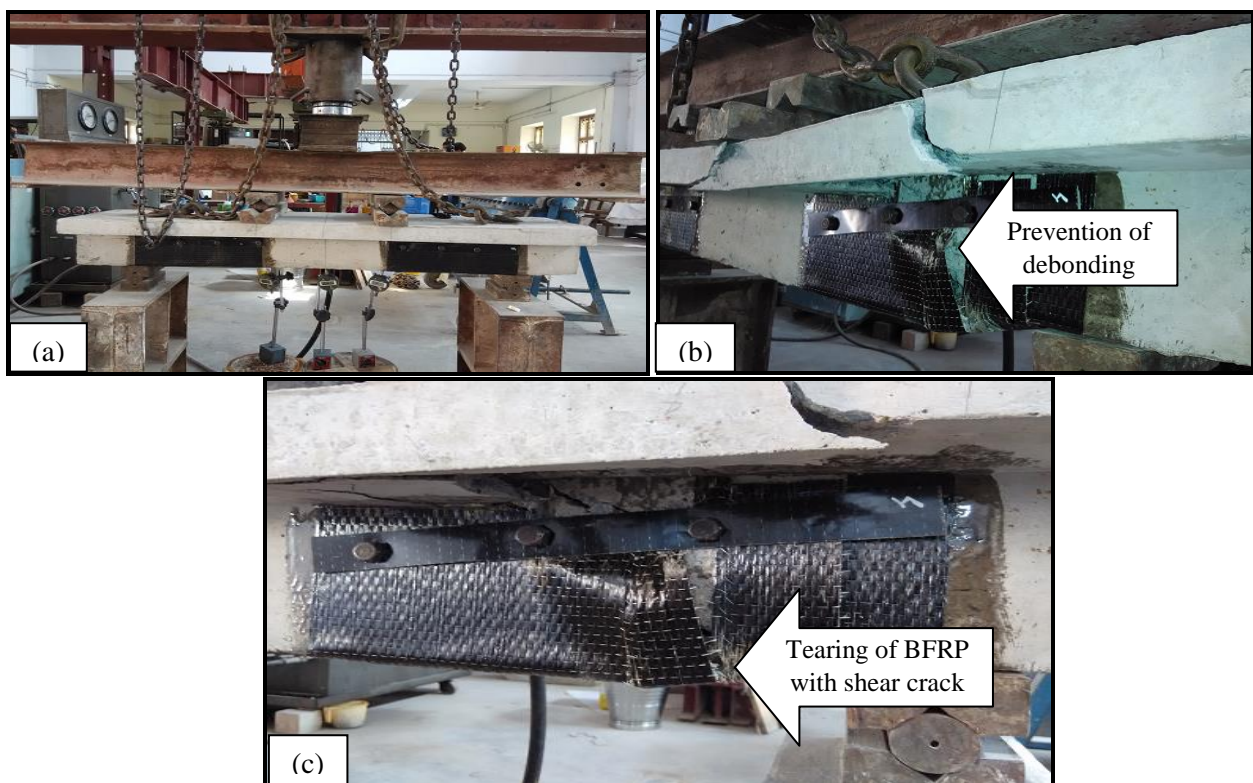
(a) Experimental Setup of beam SB10 under four-point loading system, (b) Prevention of debonding of BFRP sheet due to Anchoring System, (c) Ultimate failure of beam SB10 by tearing of BFRP sheet followed by diagonal shear crack
